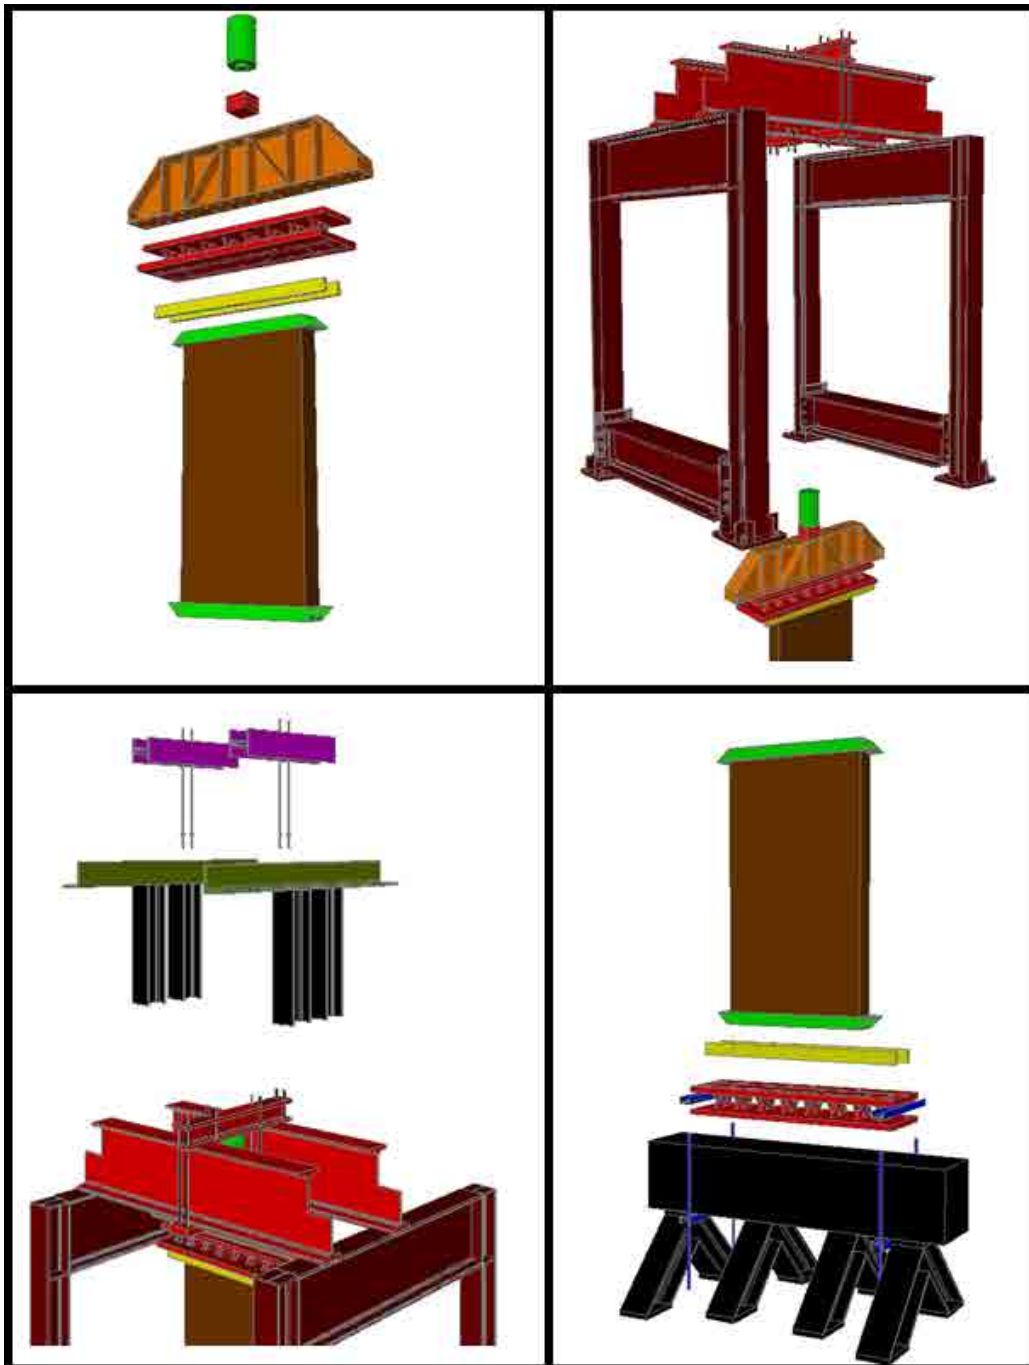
88 Test setup sketch. Up left: the wall with the heading elements (green), the steel plates (yellow) used to connect the wall to the upper hinge (red) which was fixed to the load distribution beam (orange). The range of the hydraulic jack (green) may be extended with steel plates (red). Up right: the load-reacting structure. Down left: Auxiliary elements to vertically guide (green and black) the load distribution beam and to support it (pink). Down right: supporting system for walls of M and T series with a steel beam over supports (black) where the bottom hinge (right) is fixed with auxiliary elements (blue). The wall with the heading element (green) was connected to the hinge with the steel plates (yellow).
